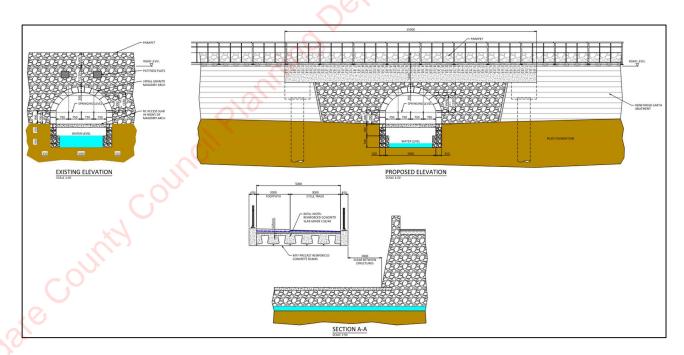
Pedestrian Bridge 1 Cross-Section and Elevation
